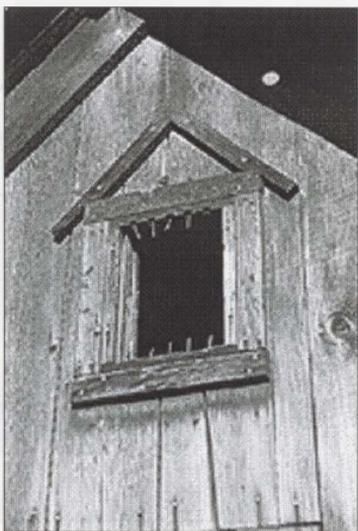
Chicken Coop, West Elevation, Detail of the Vent.
